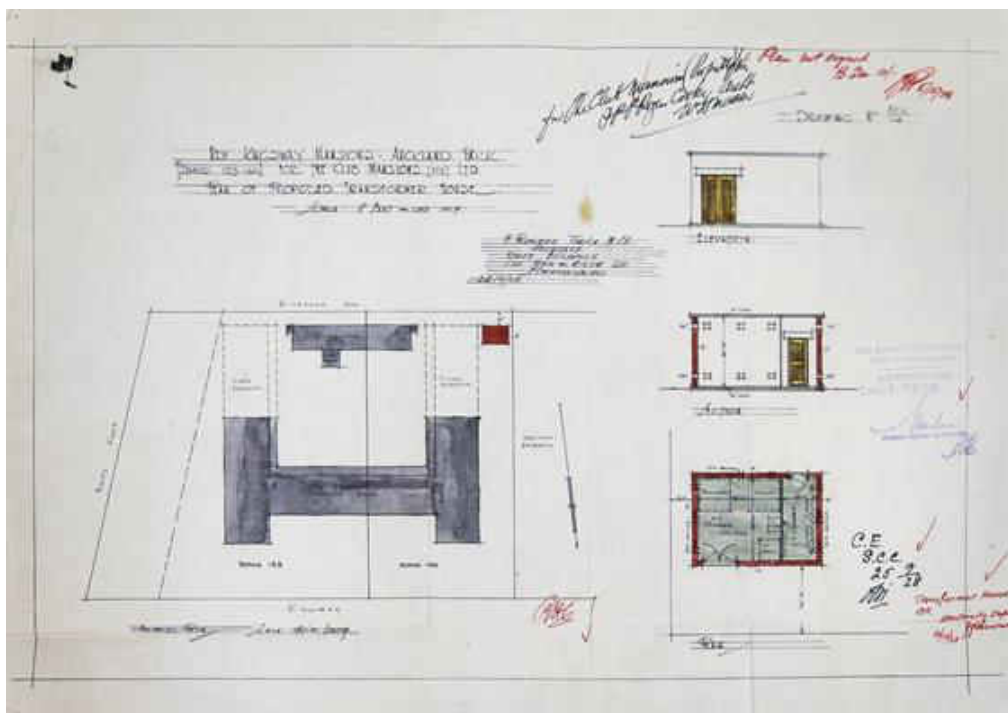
Site of the proposed residential flats along Kingsway Avenue, plan shows location of proposed transformer house on Stand 160 and proposed extensions of both wings in southern direction (Source: City Council of Johannesburg, Plans Archive)
